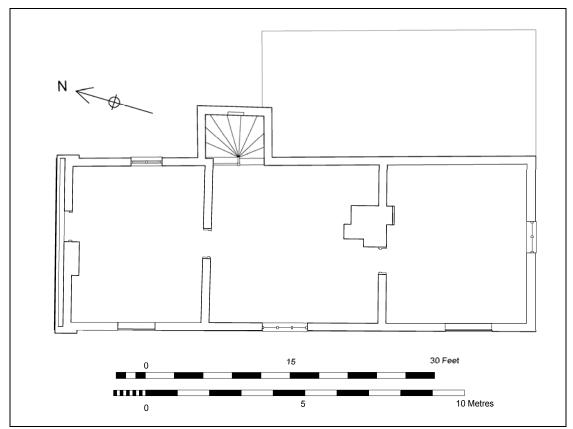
Hill Farm, second floor plan (derived from survey drawings supplied by Hayward Architects)
